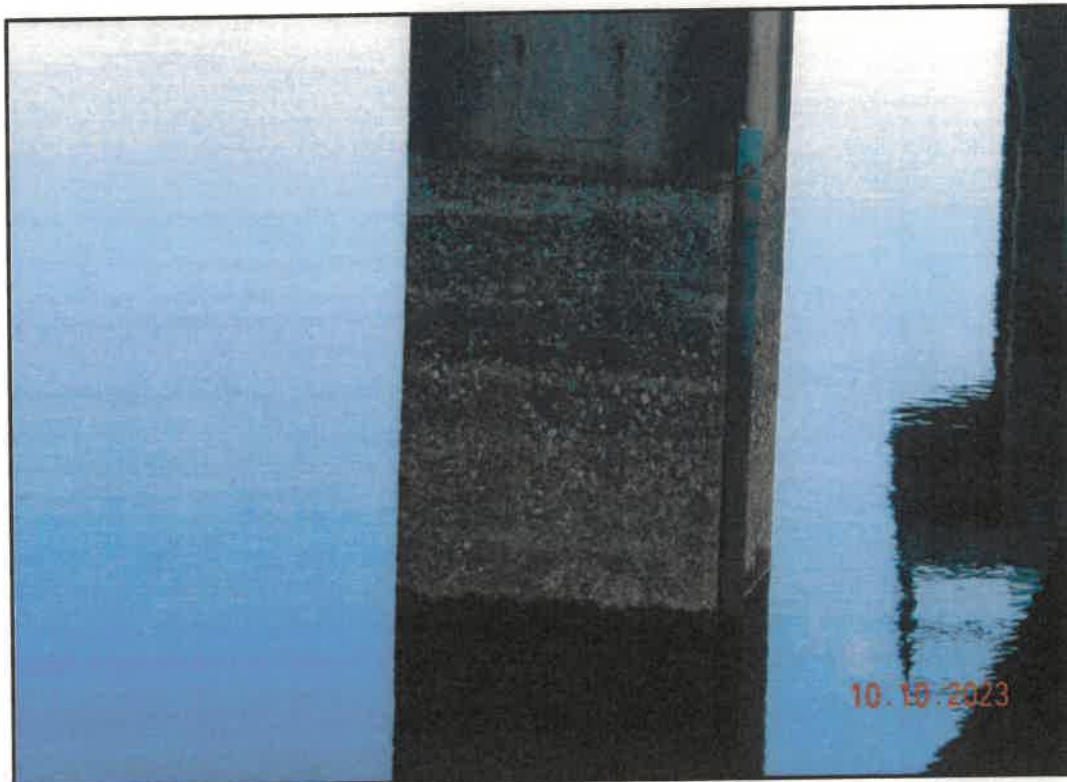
View of Bridge Pier and Staff Gauge (water level approx. 4.5' below normal pool)
